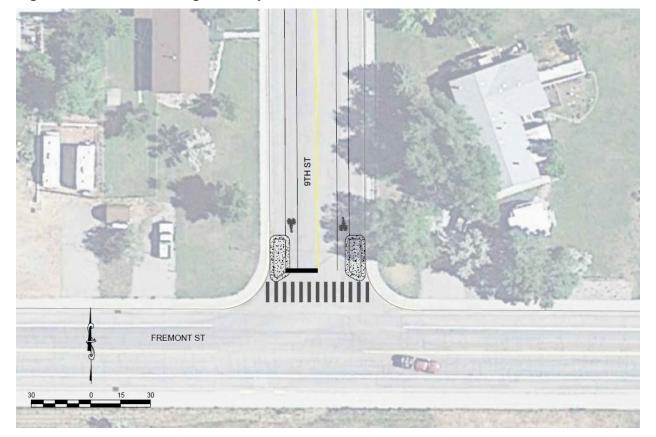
Traffic Calming Gateway Treatment at 9th Street North of Fremont Street
